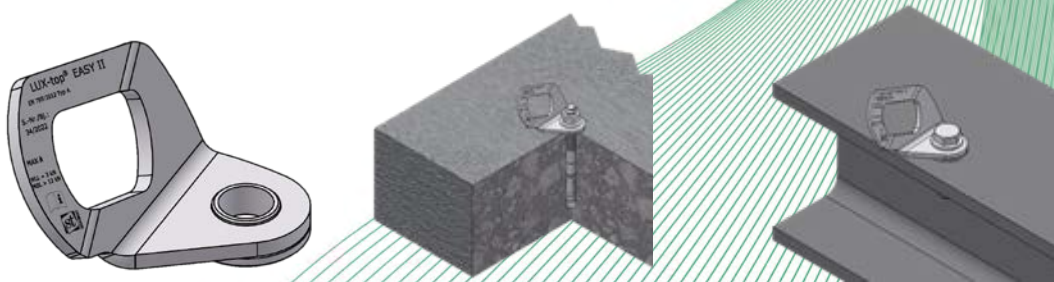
3: LUX-top® EASY II with assembly examples
